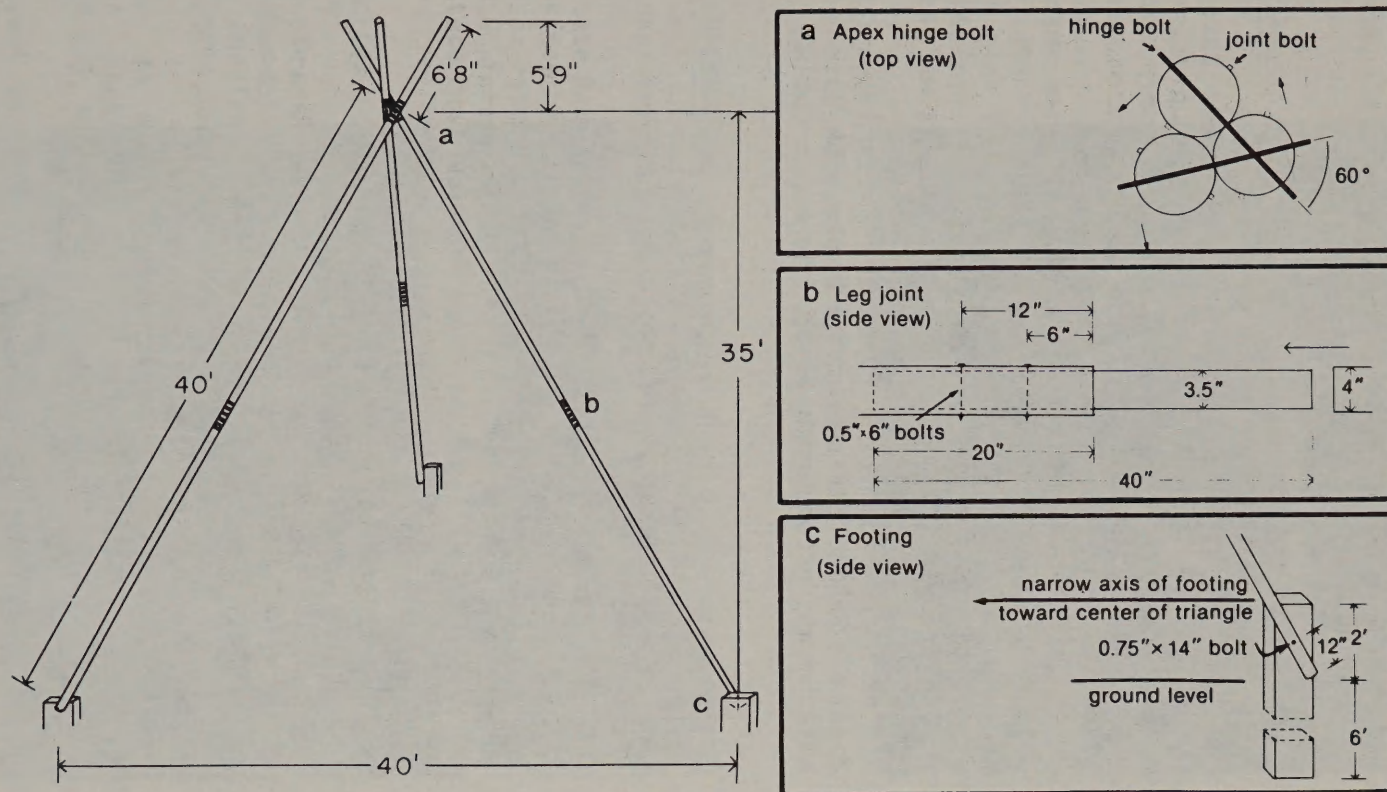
Diagram of nesting platform construction. (a) Top view of tripod. Note hinge bolt placement and joint bolt placement to allow free spreading of the legs in the direction of the arrows, (b) leg joint construction and (c) footing attachment (from Grubb 1980).
